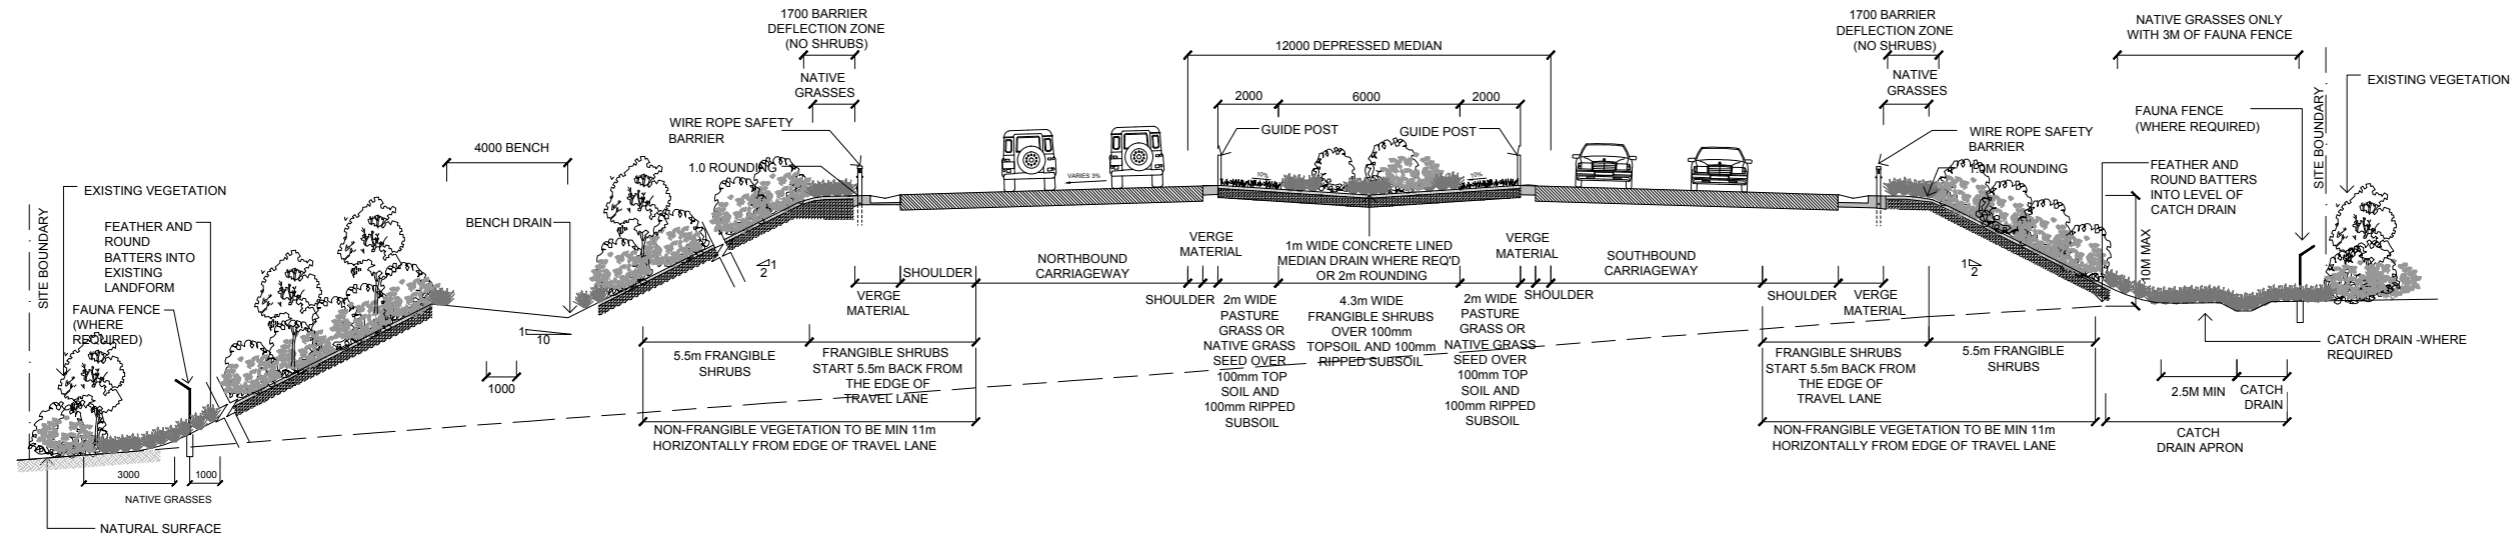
Typical Cross Section 5: Typical high embankment > 2.5m high - normal crossfall
